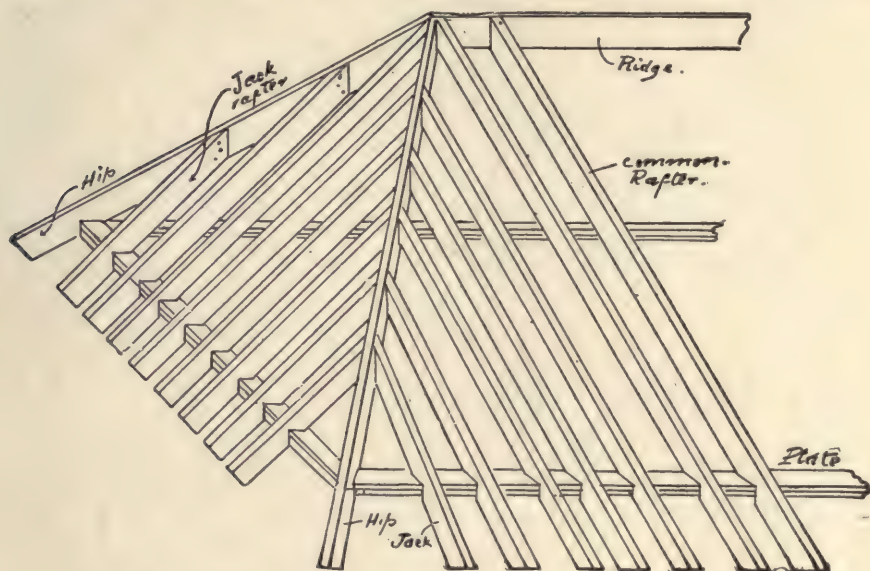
Wall Plates, Hips, Jacks and Common Rafters in Position.
